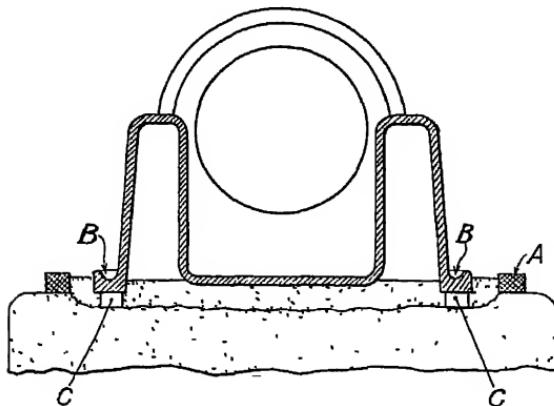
SECTION OF ENGINE FOUNDATIONS
